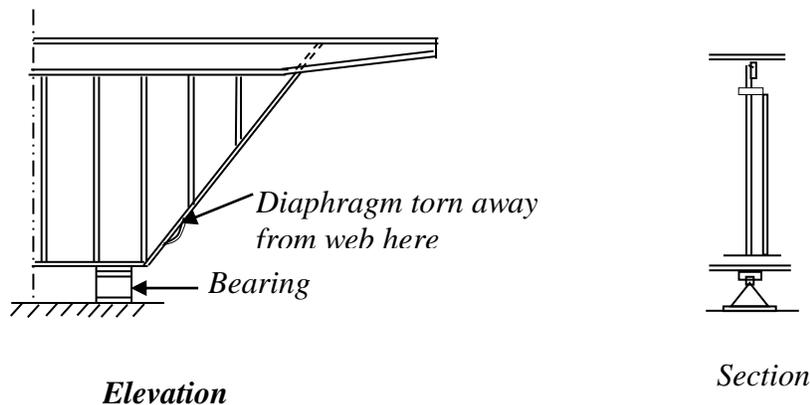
Diaphragm over Pier 6 of Milford Haven Bridge
